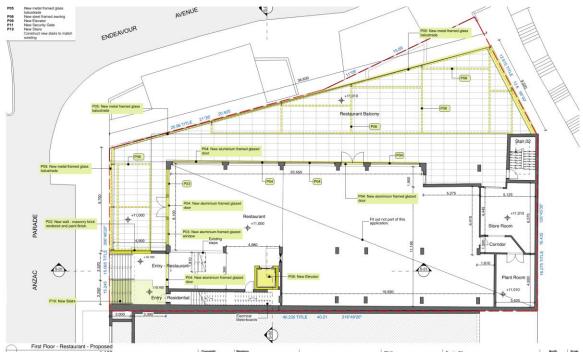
Proposed First Floor Plan - 1605 Anzac Parade
